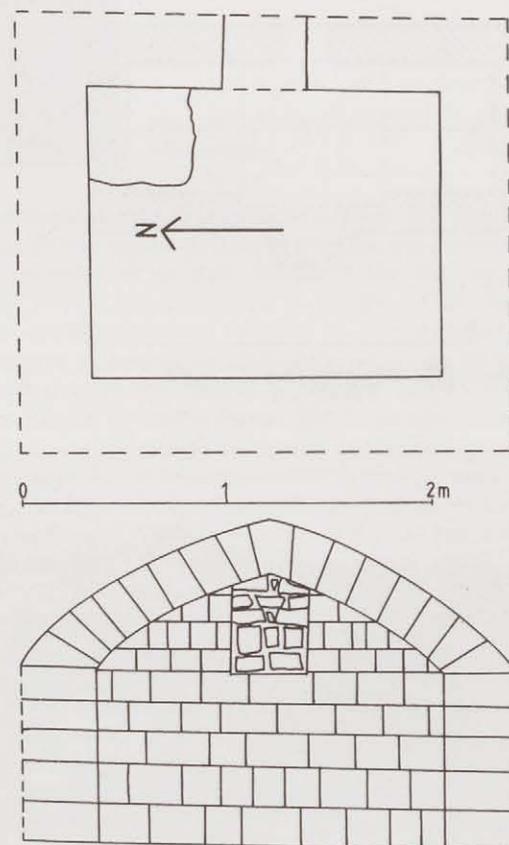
Şafad (No. 119). Vaulted tomb. Plan and section.
